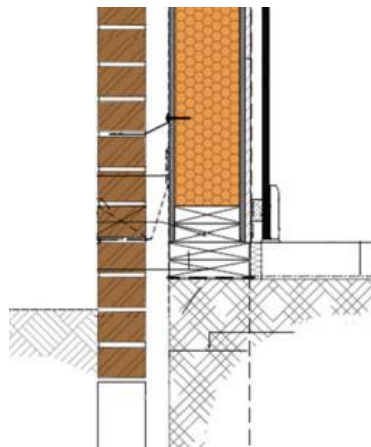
Example of structural insulated panel as external wall. Extracted from [53]
